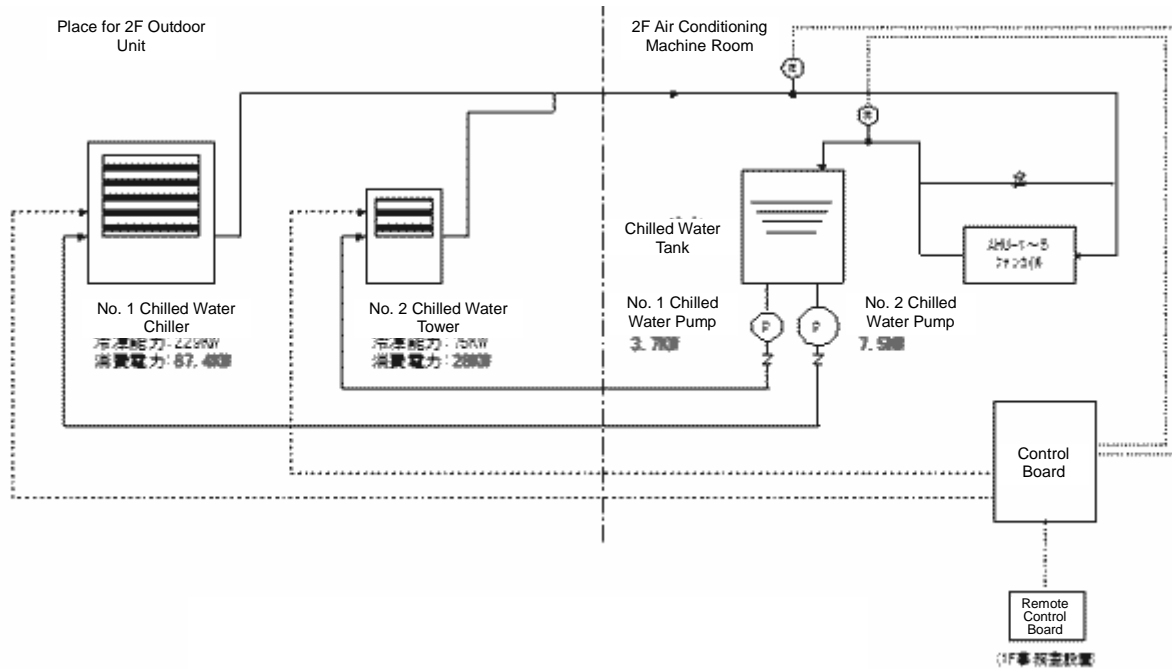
Manufacturing Room Air Conditioning System (Before Reforming)
